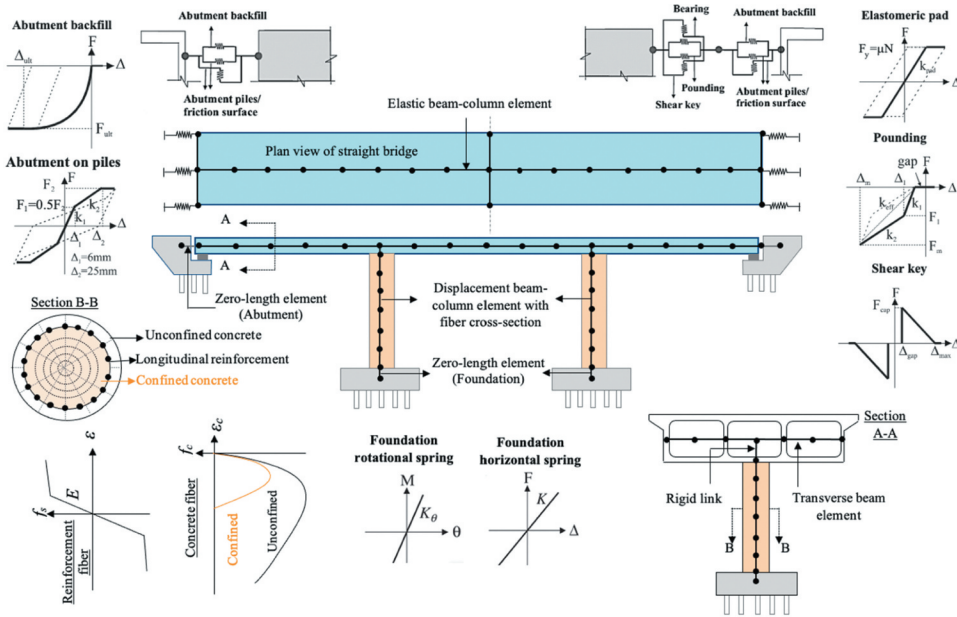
Schematic diagram for modeling a typical three-span box-girder concrete bridge.
